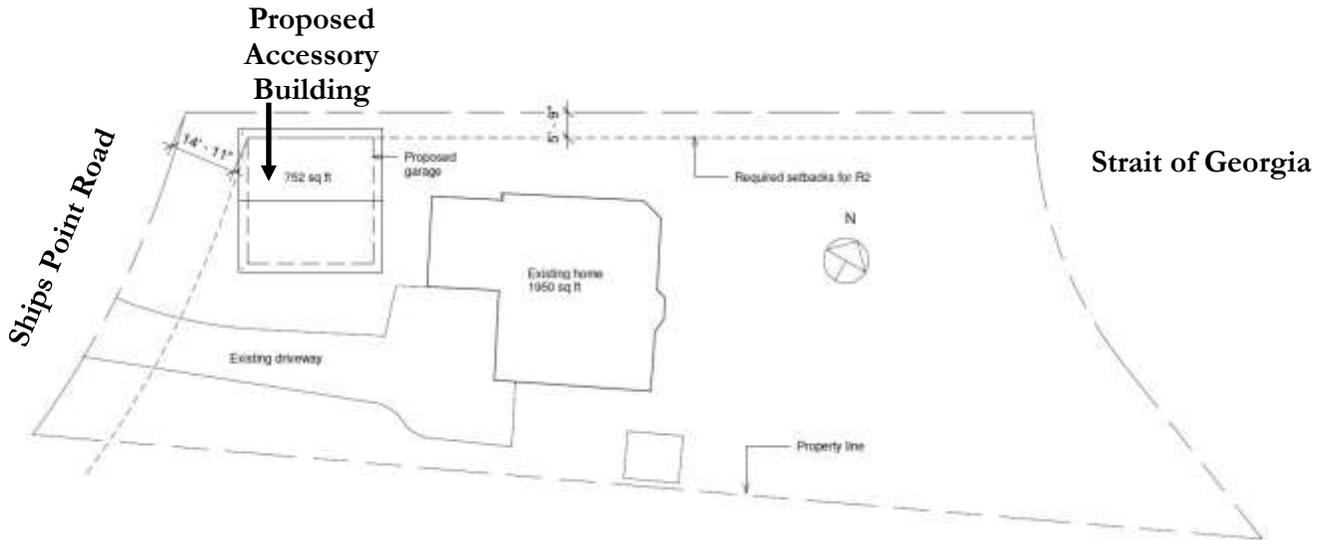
Site Plan with Proposed Accessory Building Area Enlarged
